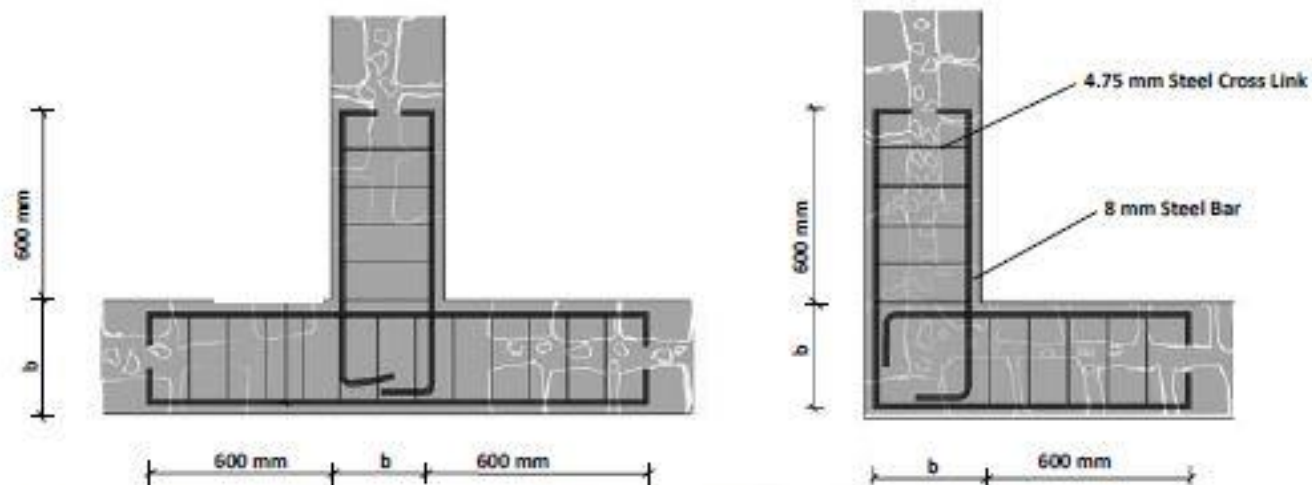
Wall stitches made from reinforced concrete with steel reinforcement (adapted from: Bothara et al. 2002)
